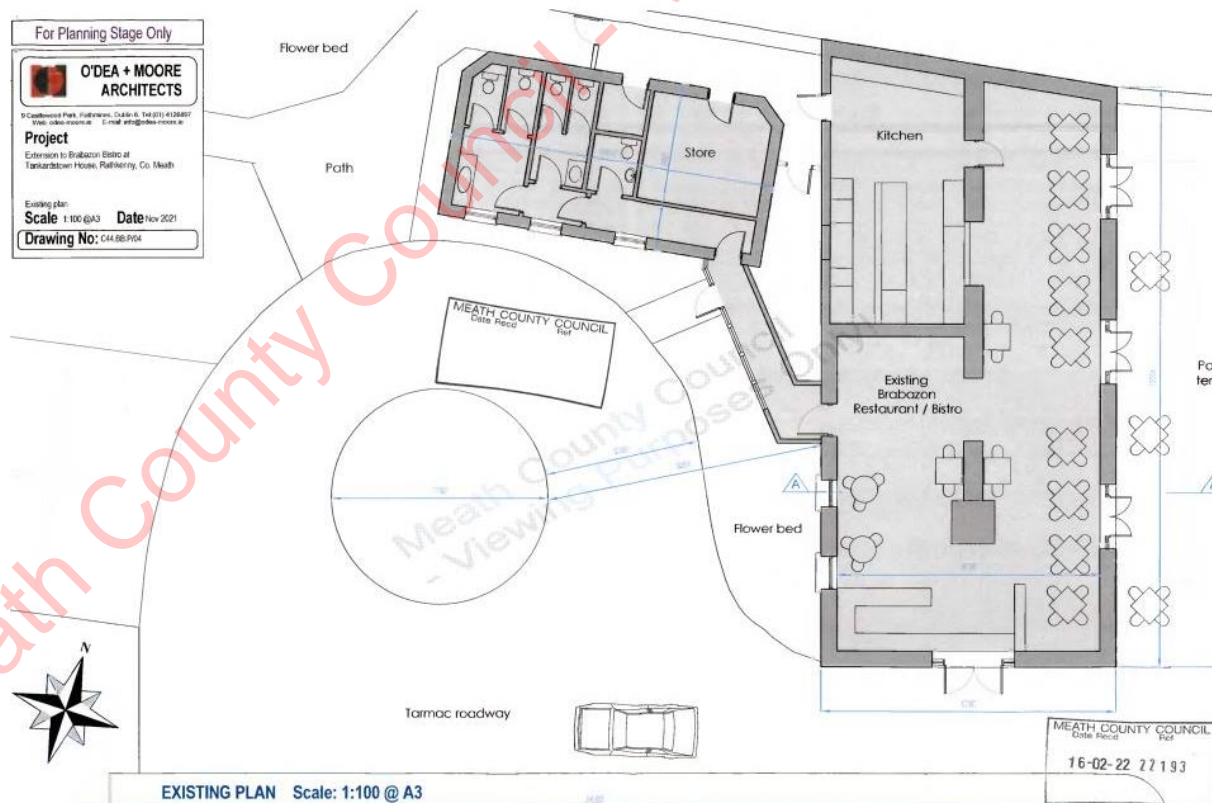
Existing layout plan submitted with application under Reg. Ref. 22193
